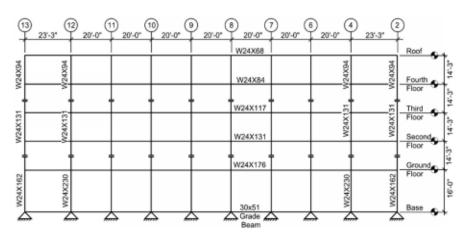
Typ. Moment Frame Elevation (Gridline P)
